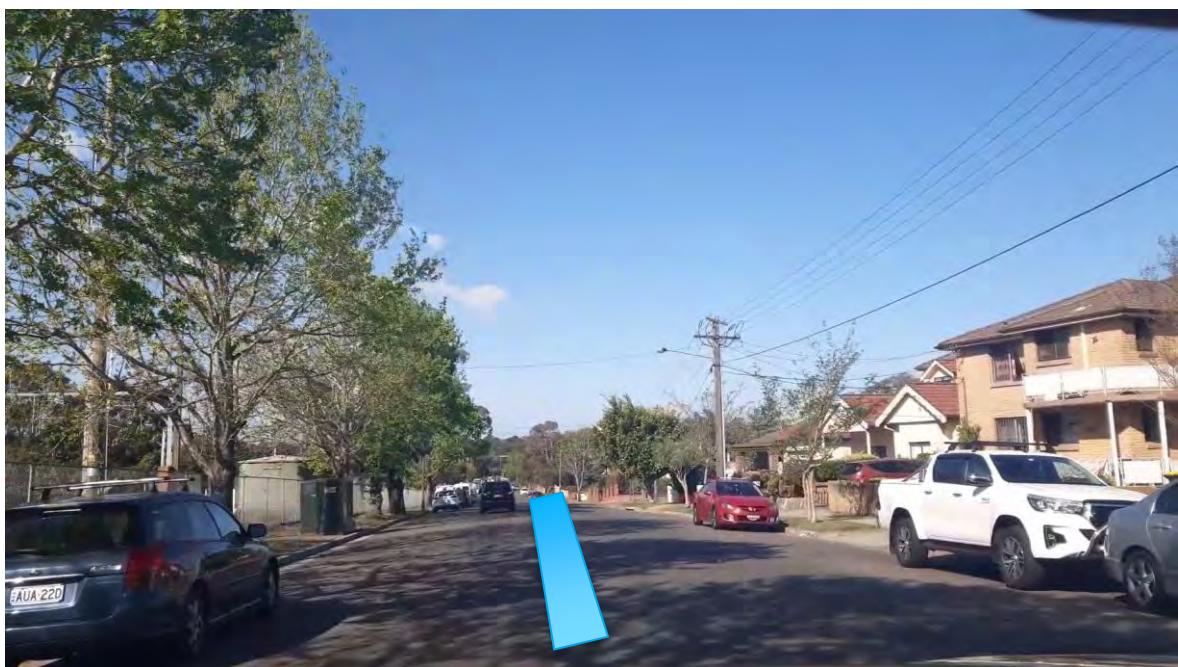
View at South Parade (looking east) towards the intersection of Gould Street.
